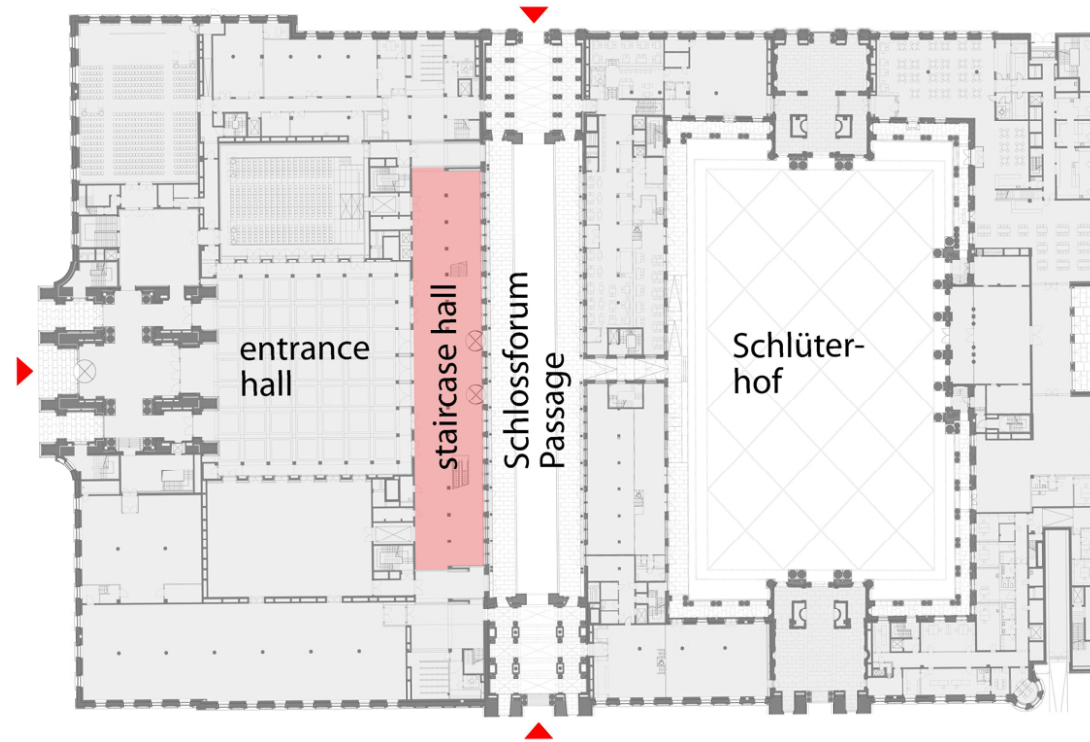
Ground floor floorplan. Source: FSPG, prepared by BBR
